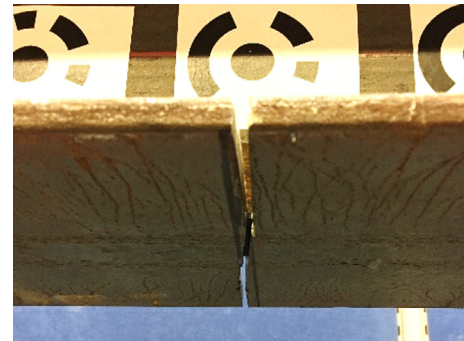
Damaging of the cross-section by slitting the bottom flange.
